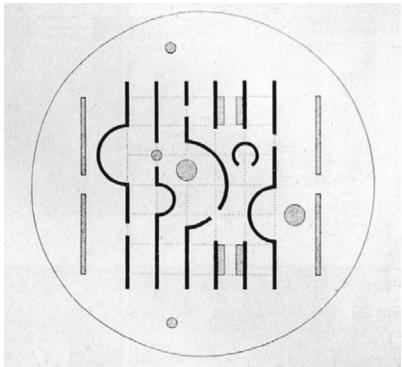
Sonsbeek Pavilion, Figure 3.25 Plan Drawing, Sonsbeek Pavilion
